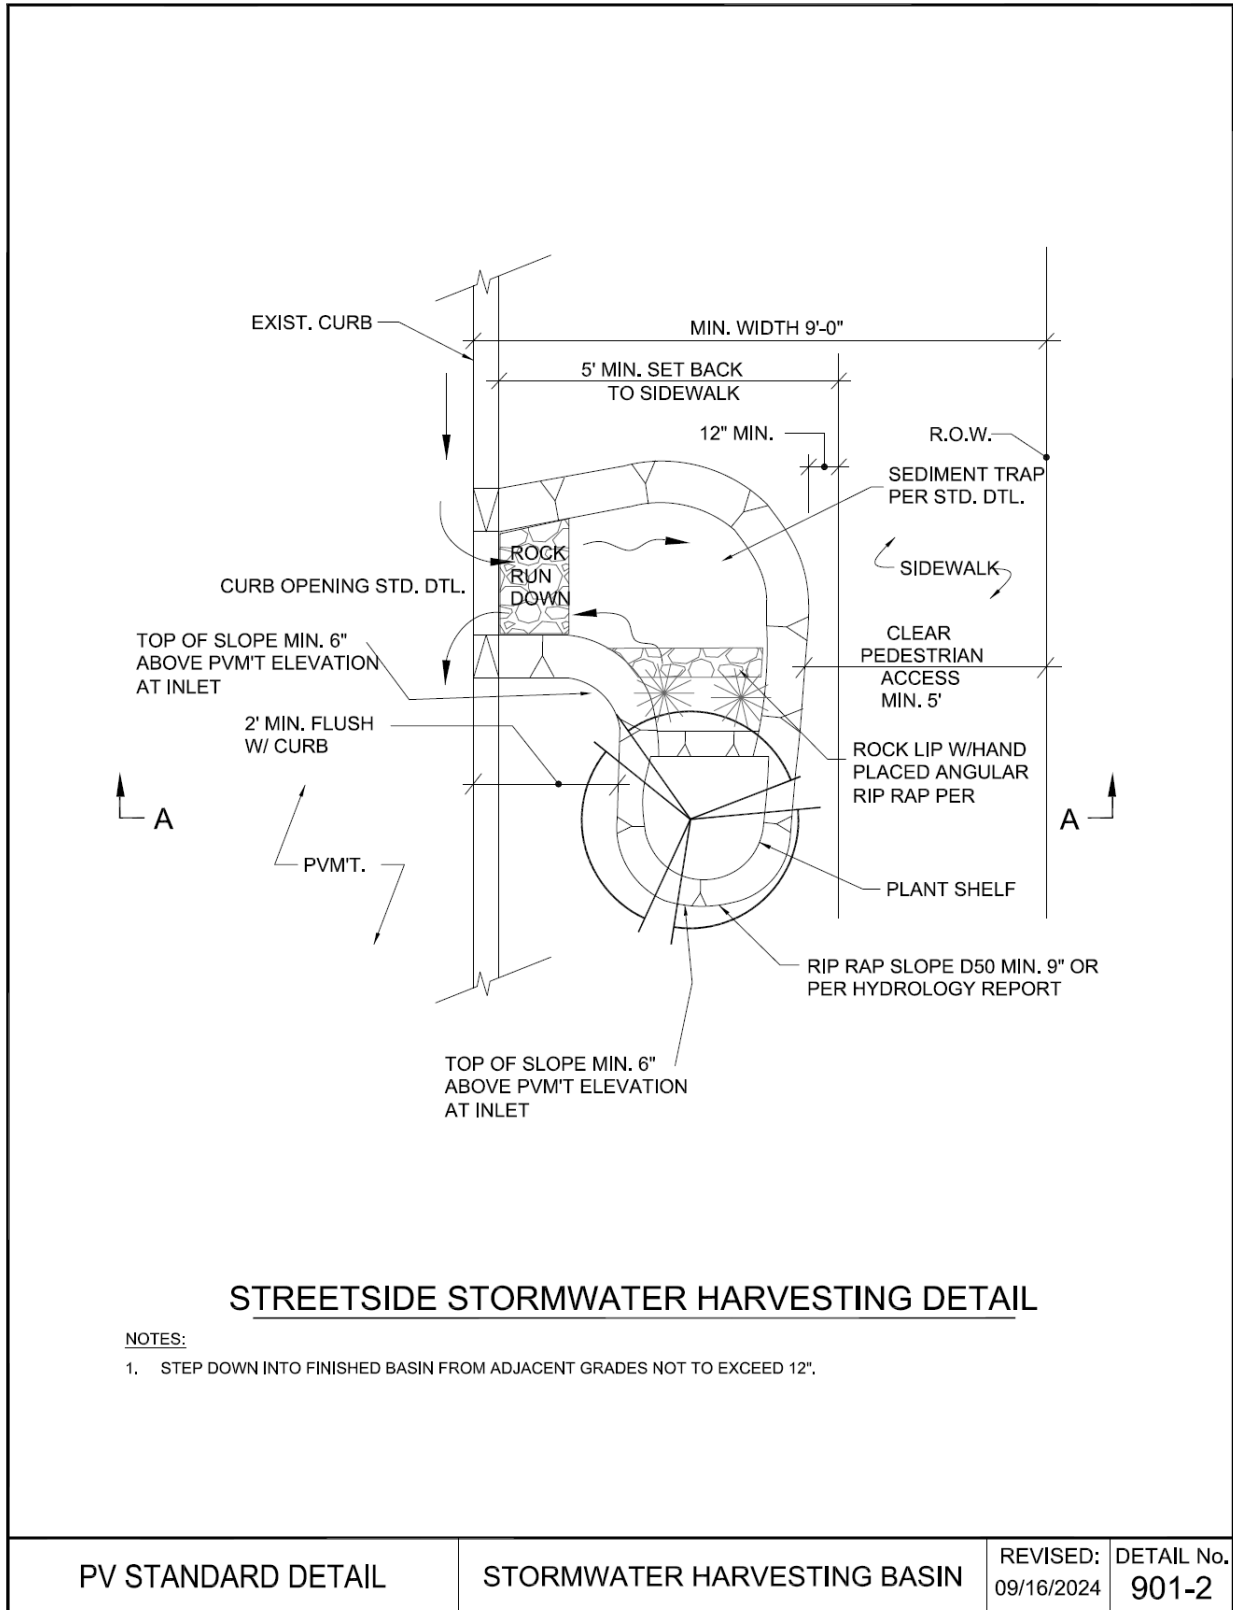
Detail No. 901-2 Stormwater Harvesting Basin
